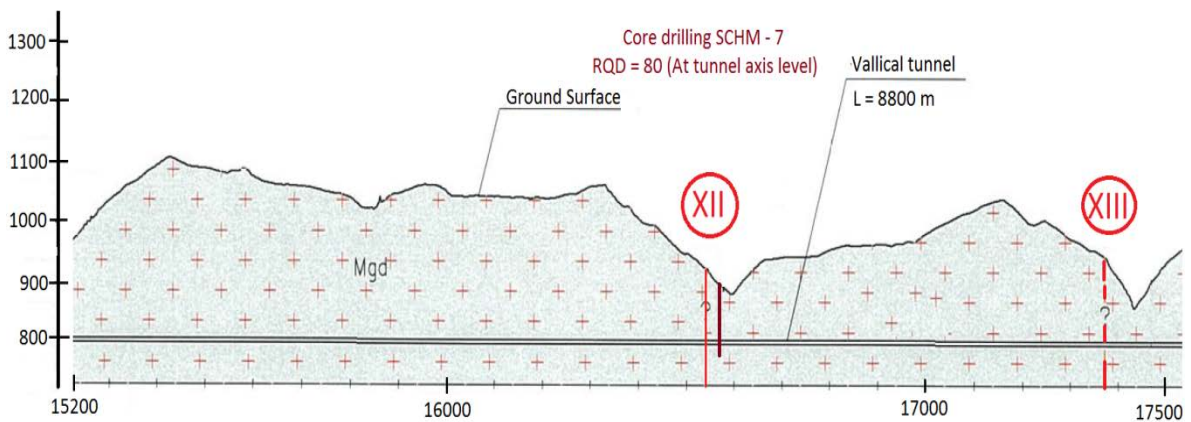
Vallical tunnel longitudinal profile Chainage 15,200 – 17,500 m.
